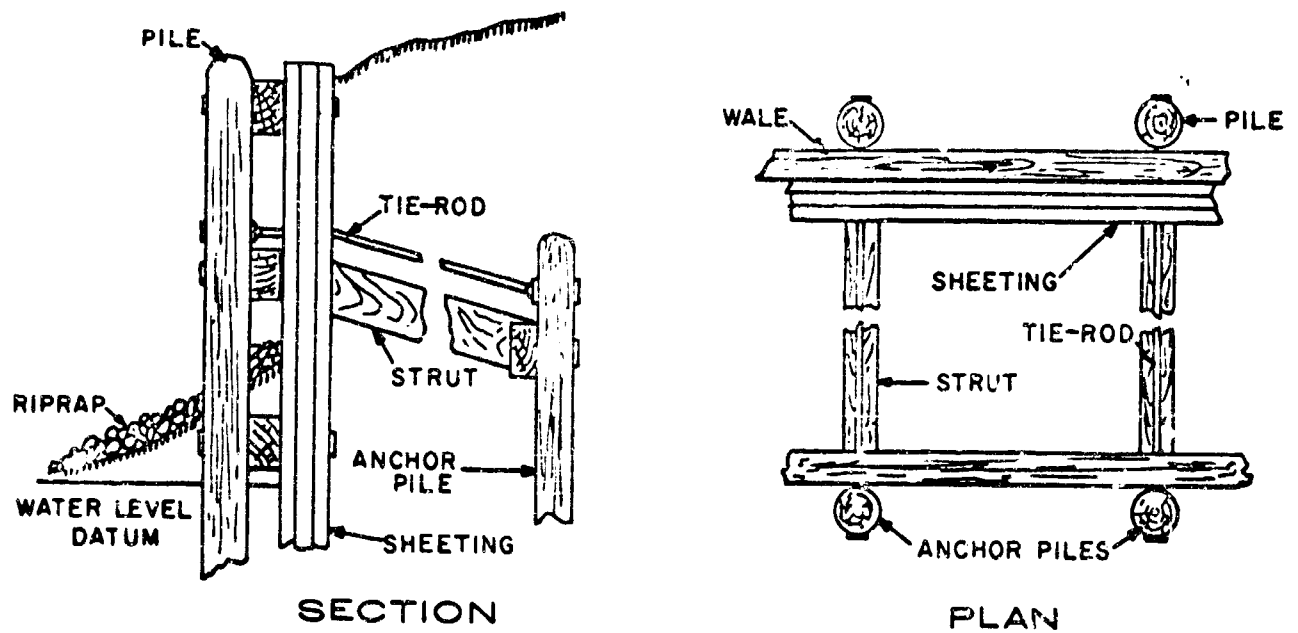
TYPICAL TIMBER BULKHEAD
